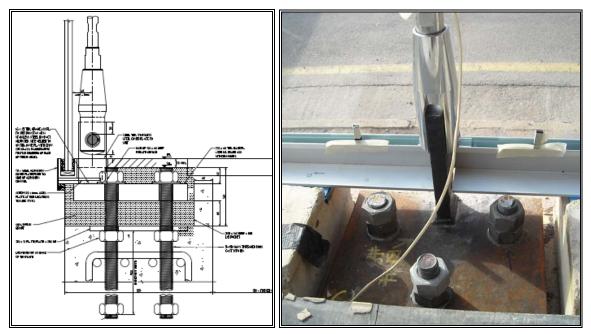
Scaled 1:2 construction drawings by Aurecon.
